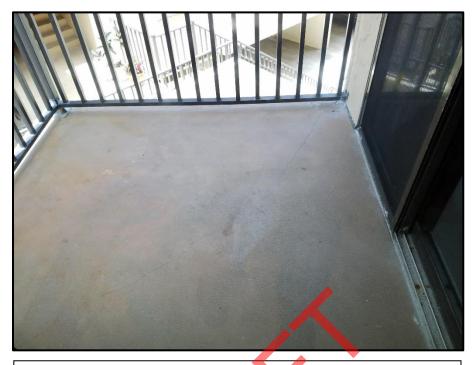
Unit #202, Sliding glass door fasteners heavily corroded and potential source of water intrusion.
